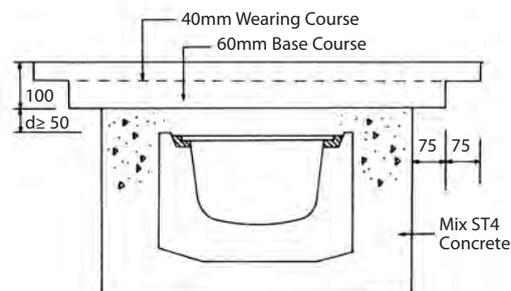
Base Block and Cover Plate detail where D=0 (existing c/way)
